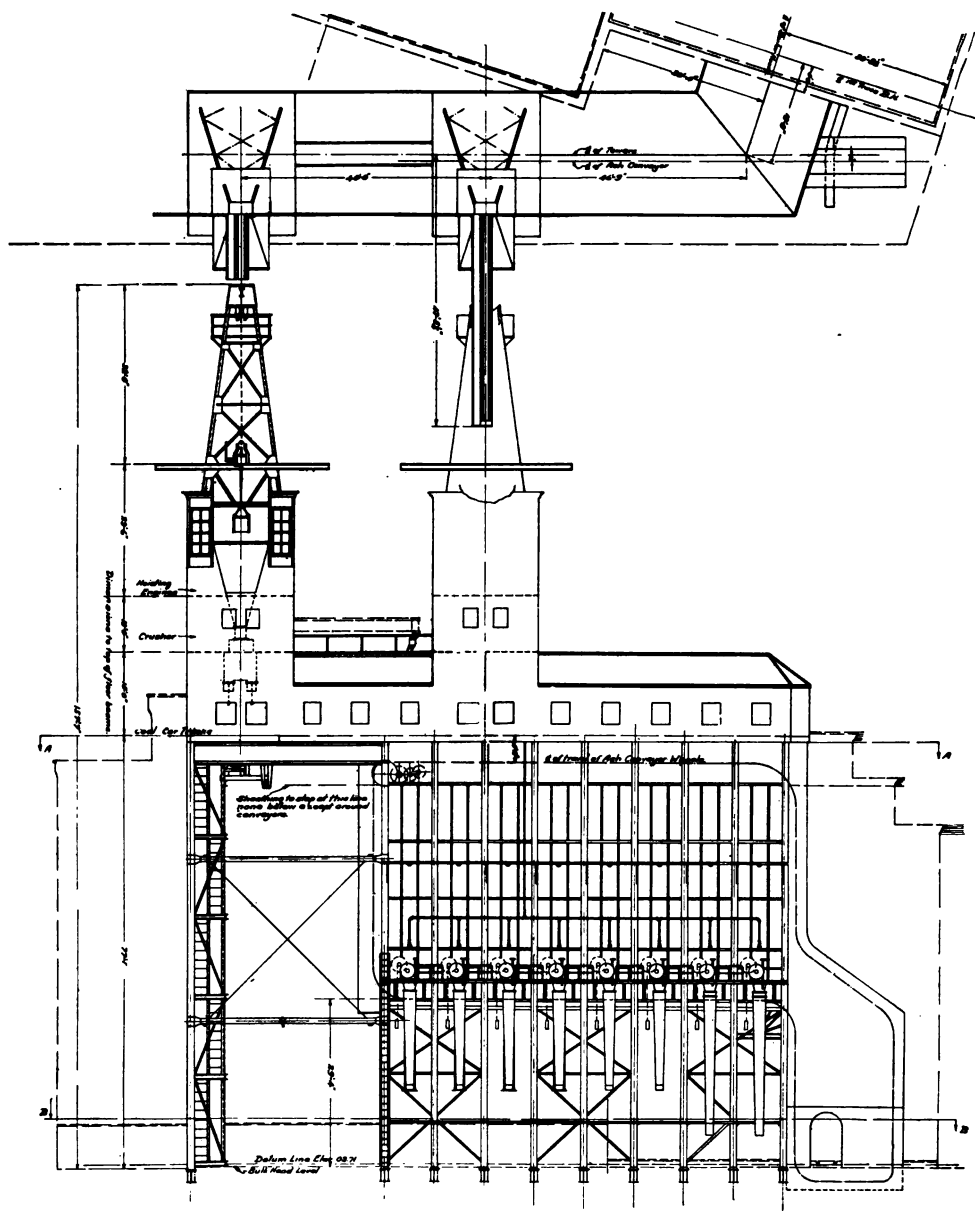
Elevation and Plan of Coal Towers and Ash Pocket, Gold Street Station.
